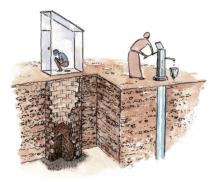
Lined pit with semi-permeable walls and open bottom, no outlet or overflow (left) and Unlined pit, no outlet or overflow (right).
